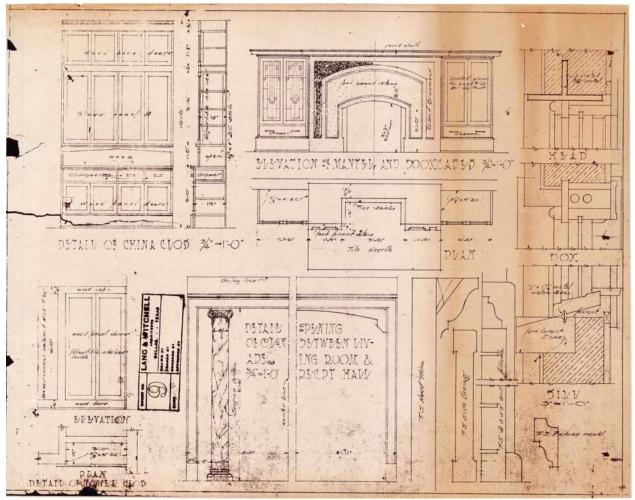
Original Lang and Witchell Interior Details – Unnumbered. Sheet 9 of 9 $\,$
